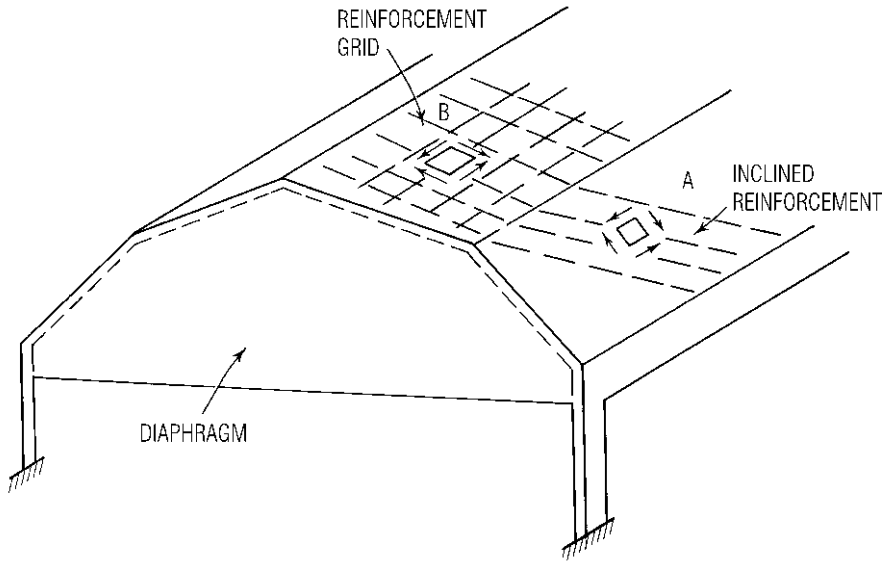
Reinforcement patterns in the plates of a folded-plate roof.
